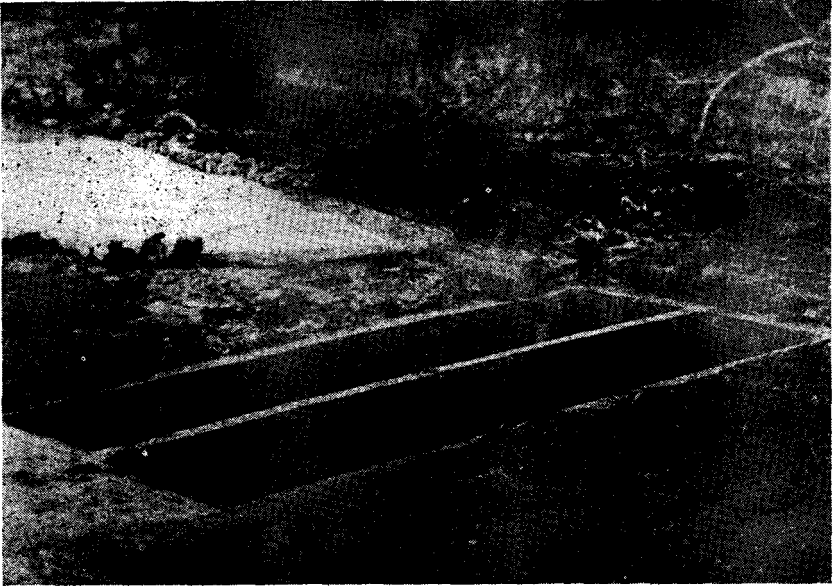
Completed tank and drinking ramp ("gallinaceous guzzler M-2-A"). A portion of the concrete apron is shown at upper left. Roof, baffle, and shade slabs will be installed in the next step of construction.
